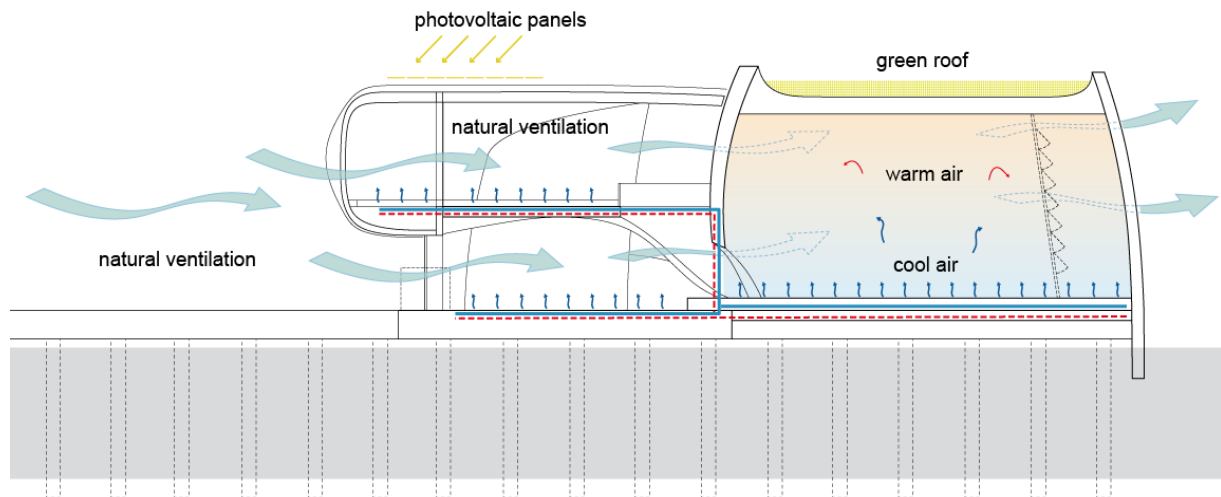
Section showing the existing climate design concept for the pavilion, figure adapted from Transsolar, Stuttgart München, New York.
